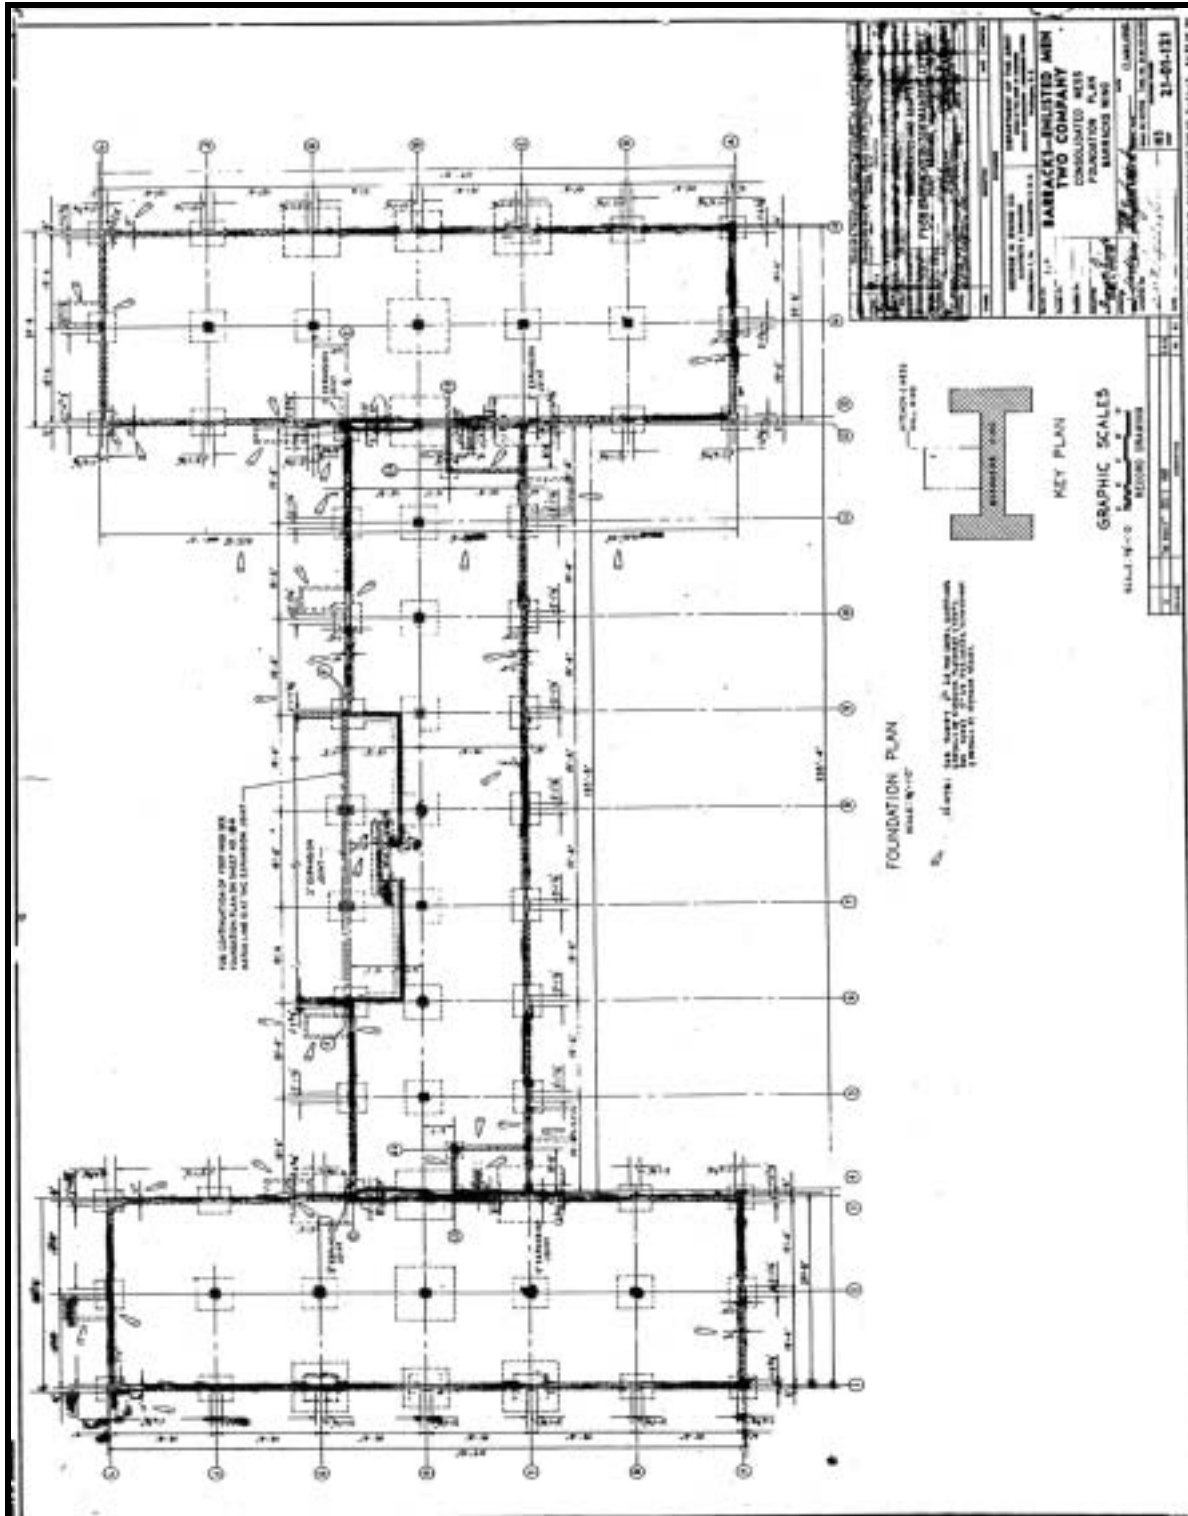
H-style, two-company barracks, barracks wing, foundation plan (ca. 1955, revised 1958) (Engineering, Ft. Benning).
